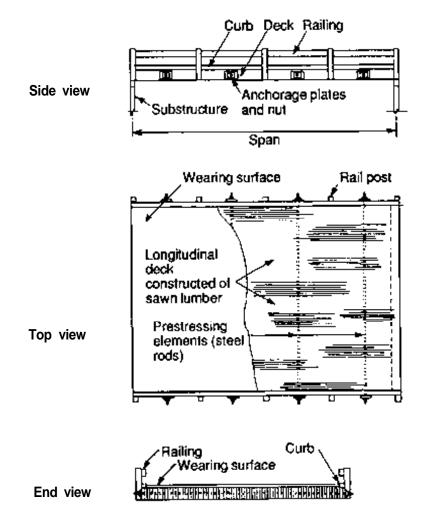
Typical configuration for a longitudinal stress-laminated lumber deck bridge.
